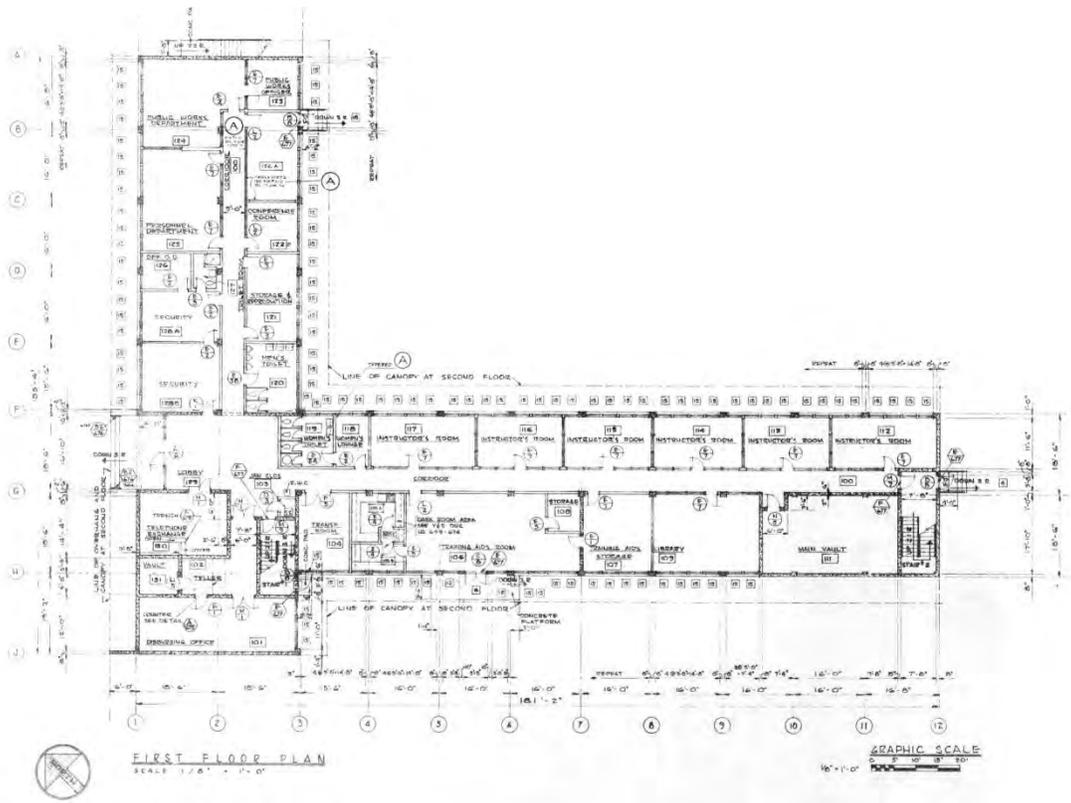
As Built first floor plan view of original NTU administration building, Feature 1.
